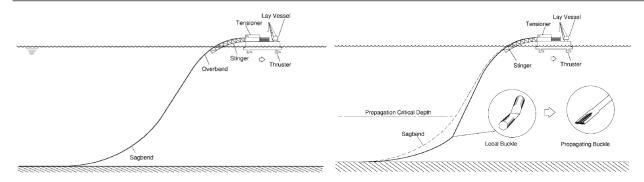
S-lay pipeline installation – adapted from Aziz (2011)
